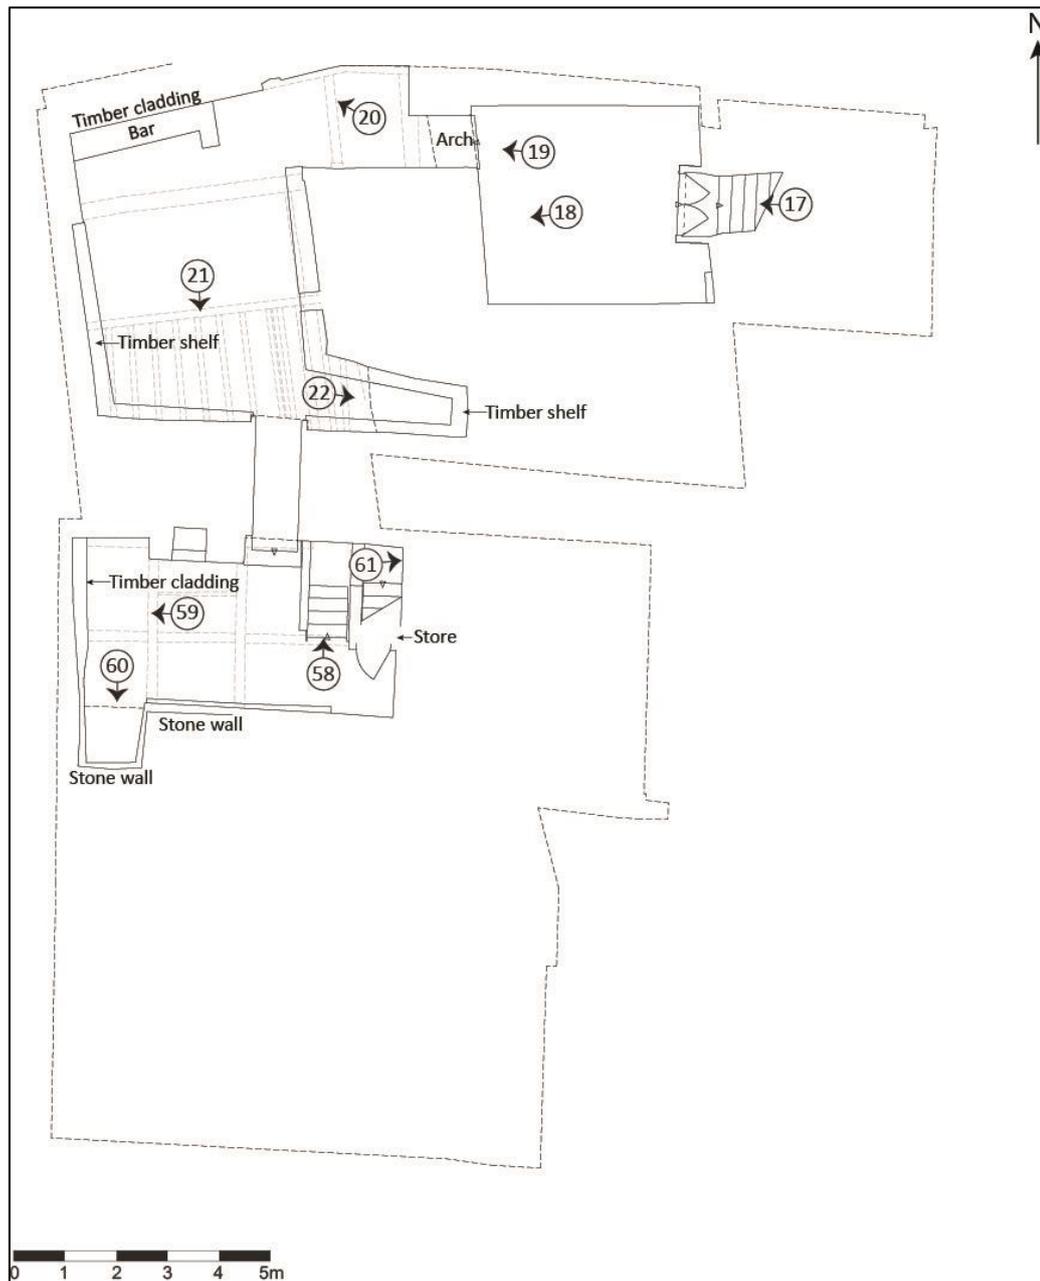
Annotated plan of basement of Nos 17 & 17A High Street showing location of photos taken
